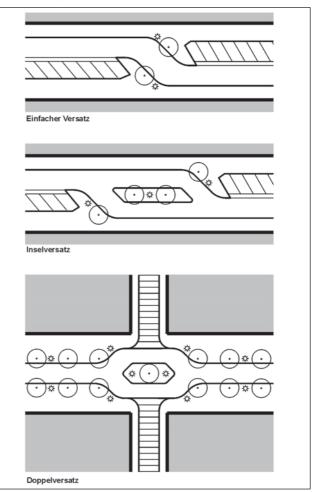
Examples of chicane layouts between junctions (outline sketches)
